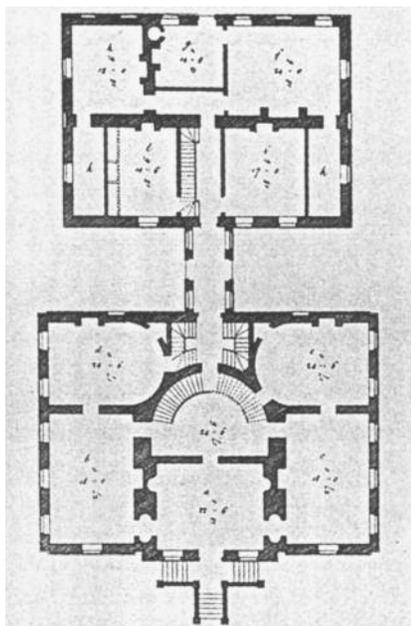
James Paine, ground-floor plan of St. Ives, Bingley, Yorkshire, from his *Plans, Elevations, Sections of Noblemen and Gentlemen's Houses*, I, London, 1767.
